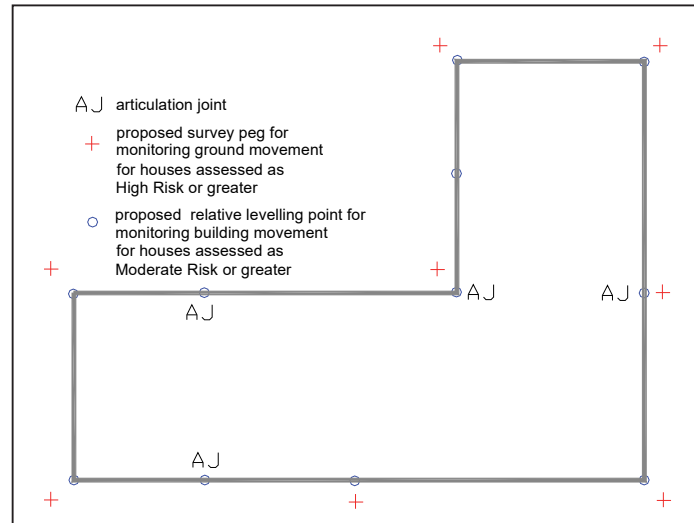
Schematic layout for ground movement and building level surveys around a typical building
